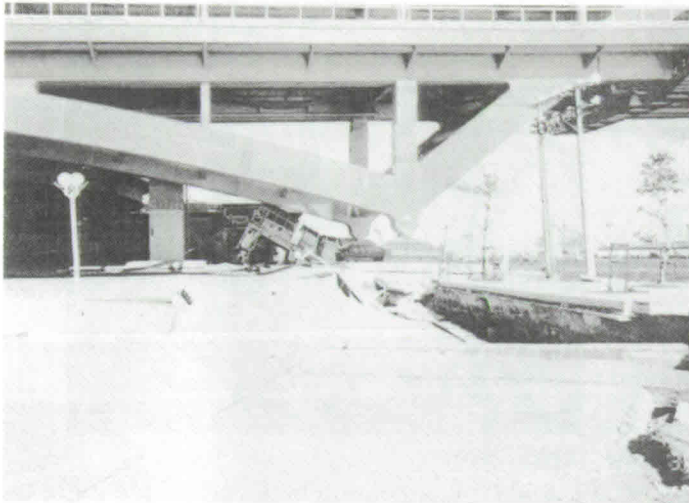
Damage to ground behind the abutment of the Kobe Bridge (Kobe side)
